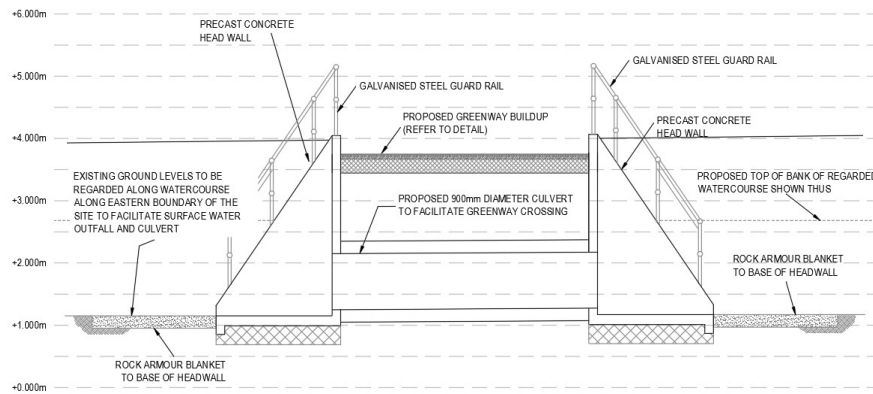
Proposed Long section of Culvert Crossing to accommodate Greenway Infrastructure (Refer to DOBA Engineering drawing 2432-DOB-XX-SI-RP-C-1210)
